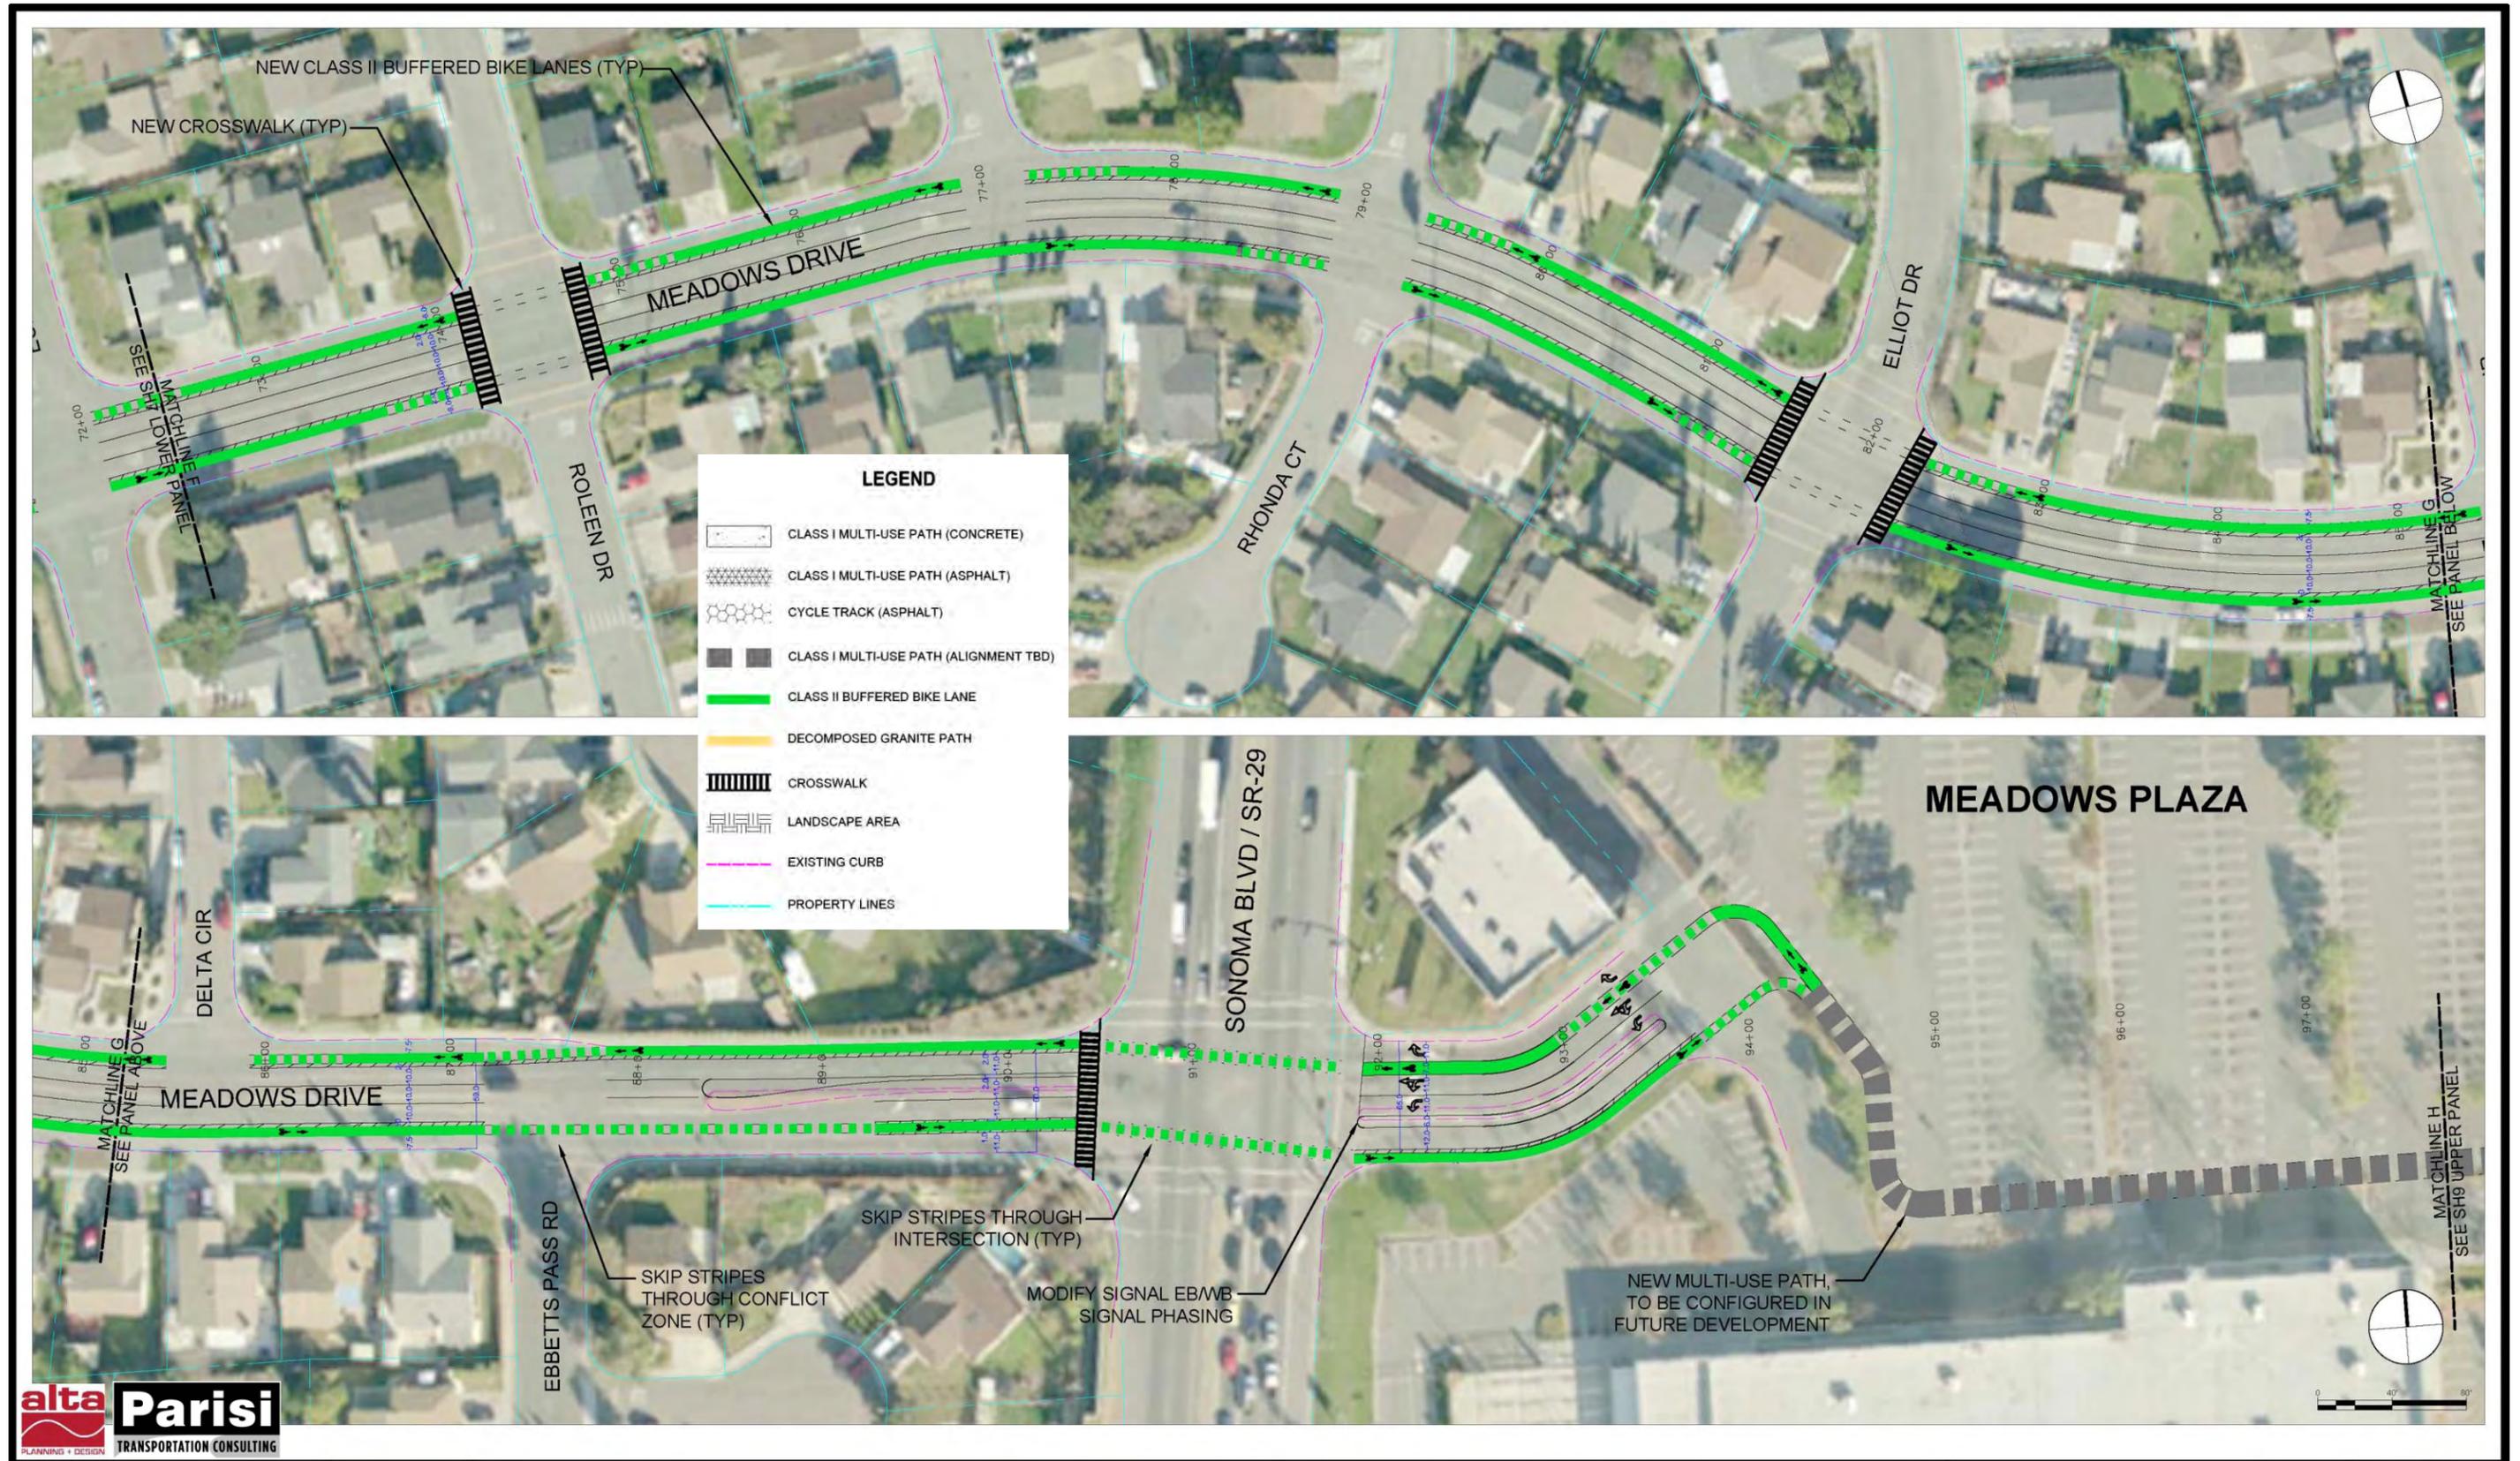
Segment 2 Detail Map B (plan set sheet 8 of 13)
